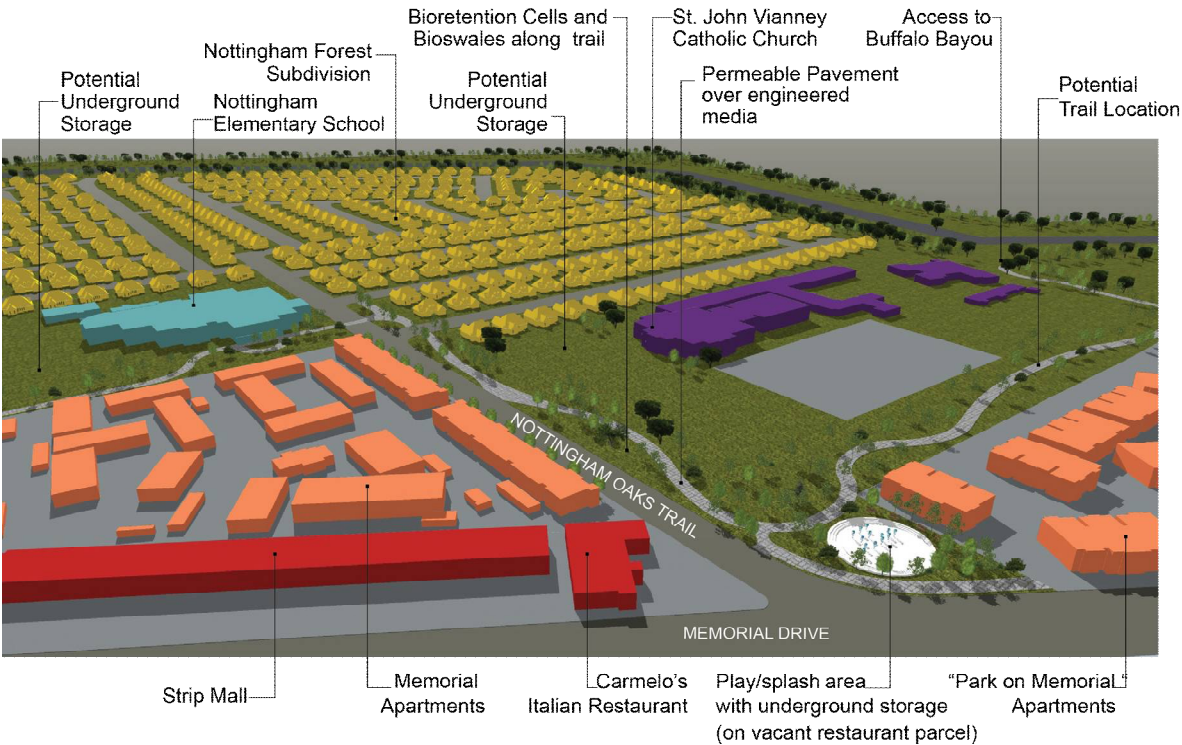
Bioswales carry parking lot stormwater runoff to underground storage vault.
